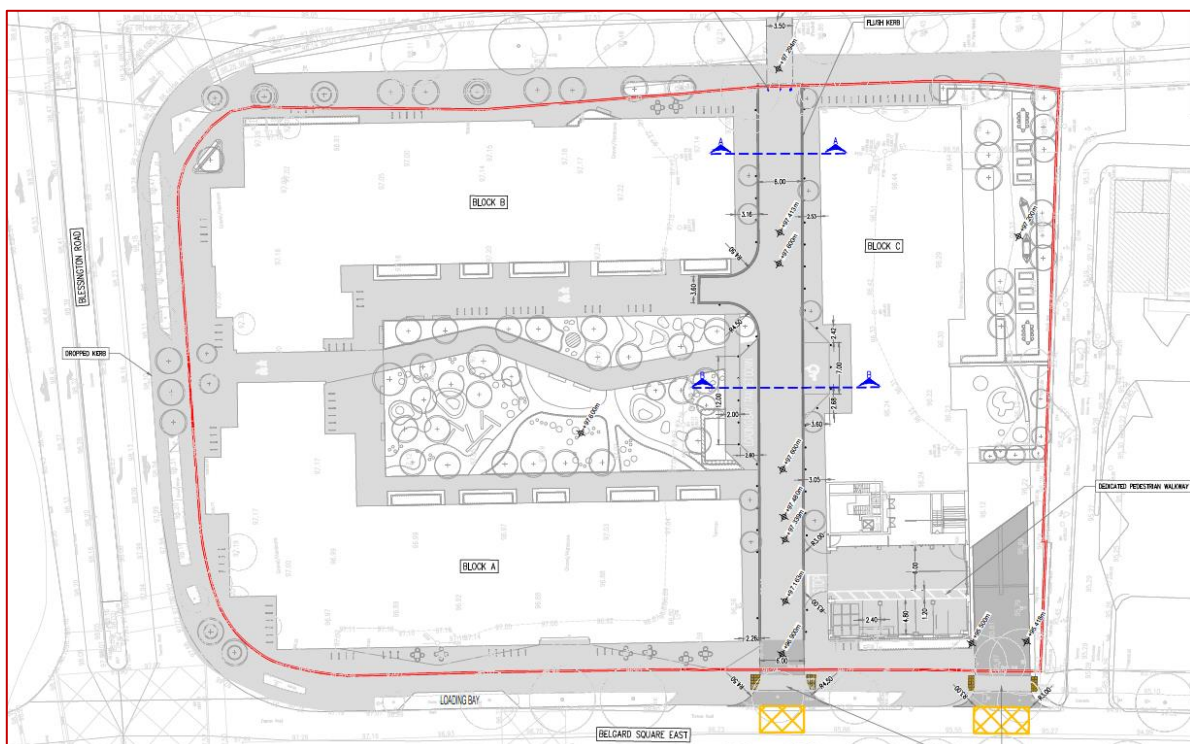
LAYOUT OF THE PROPOSED DEVELOPMENT
